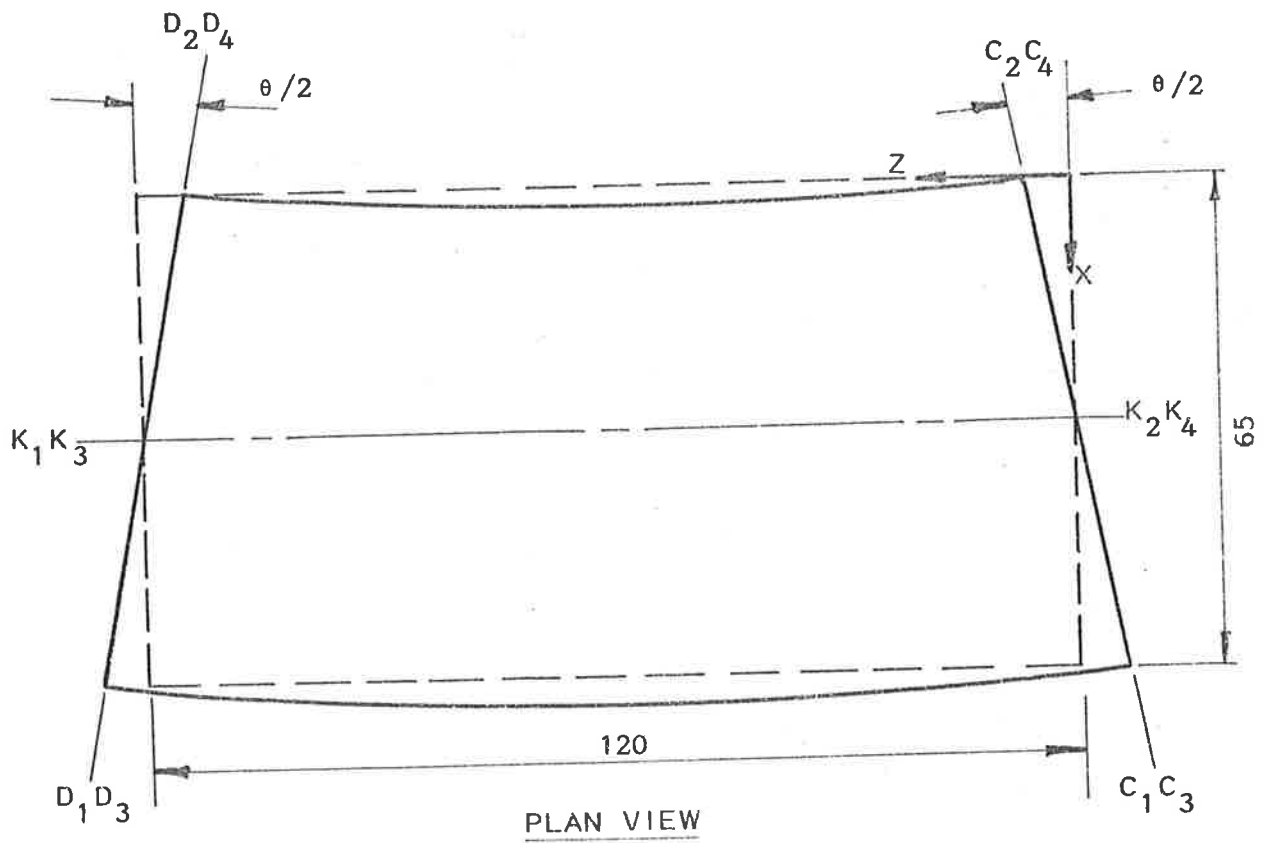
Bending of Panel Module Parallel to the Bedjoints
